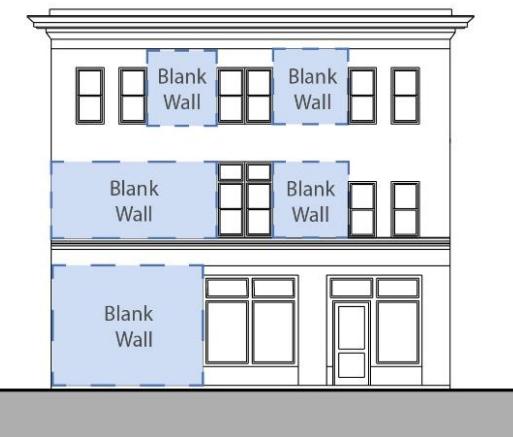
Large areas of blank walls—areas without windows, doors, or surface relief—on the front façade of a building should be avoided.
